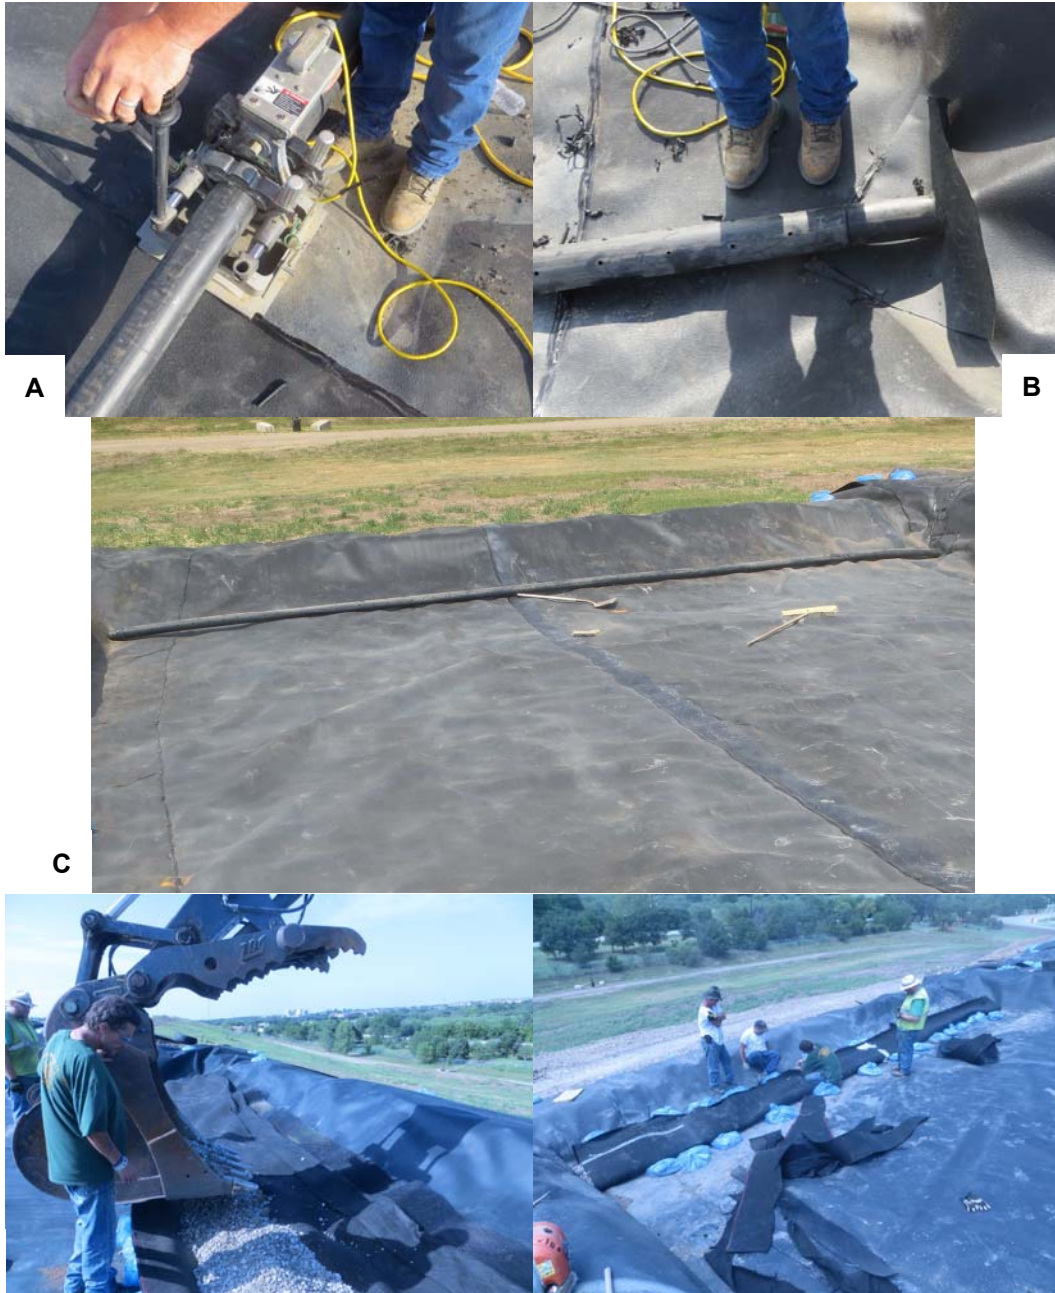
Percolation piping system construction a) cutting the HDPE pipe to join adjacent pipes, b) boot placement within a lysimeter, c) percolation collection pipe placed in a lysimeter, d) pea-gravel placed in the percolation piping system, and e) placing zip-ties to join the geocomposite drain.
